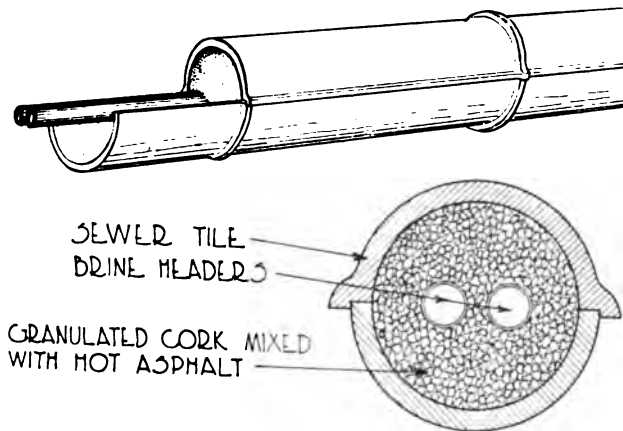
METHOD OF INSULATING PIPE UNDERGROUND.
